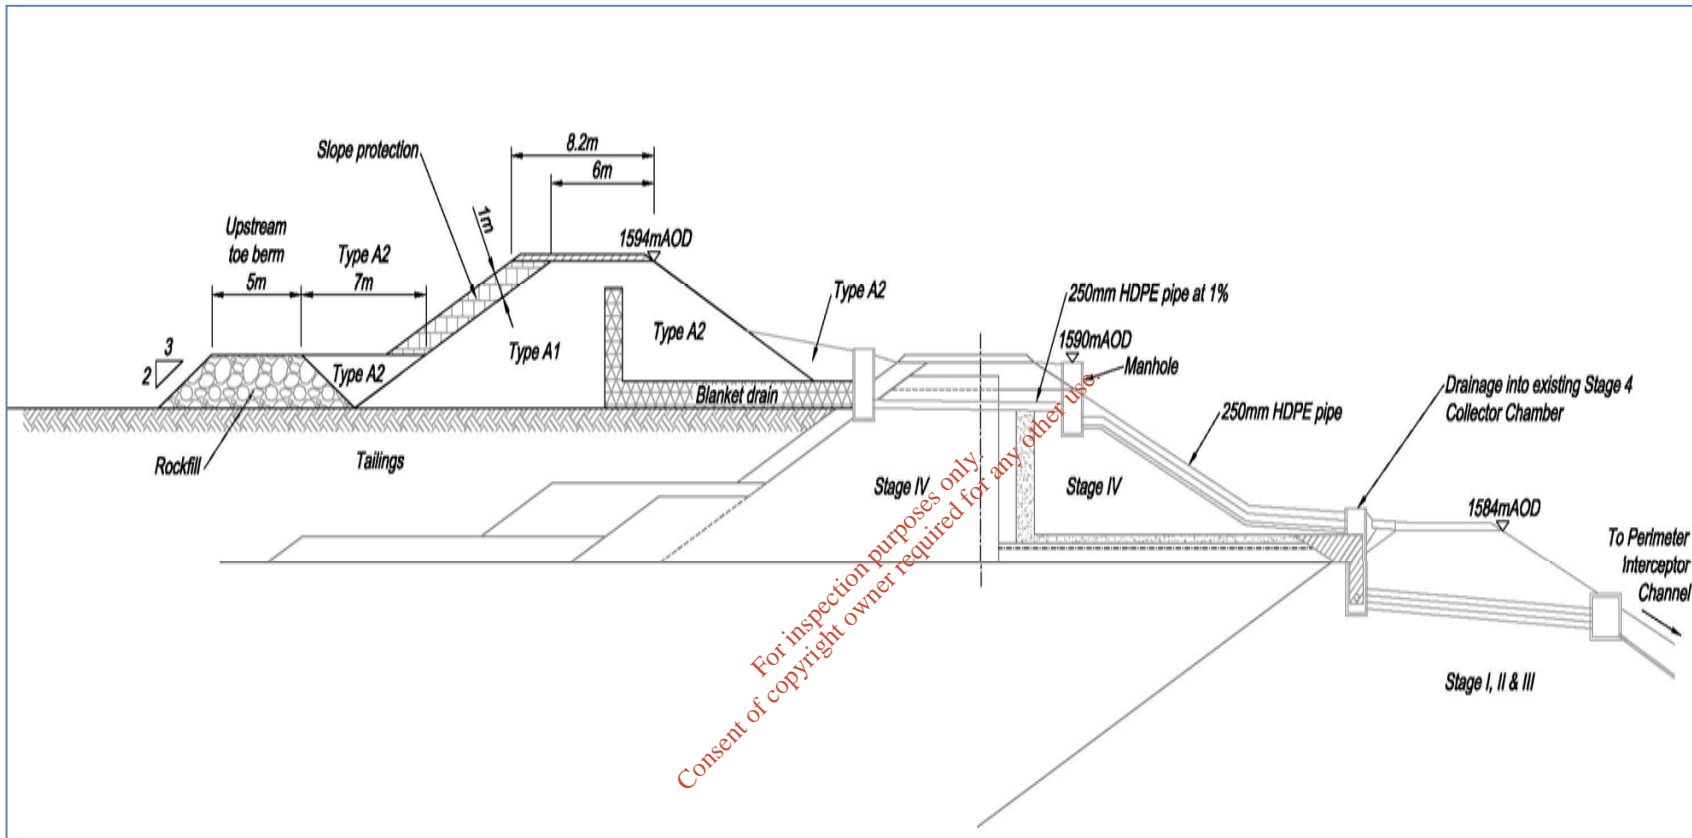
Cross-section through tailings embankment wall showing the proposed stage 5 extension
